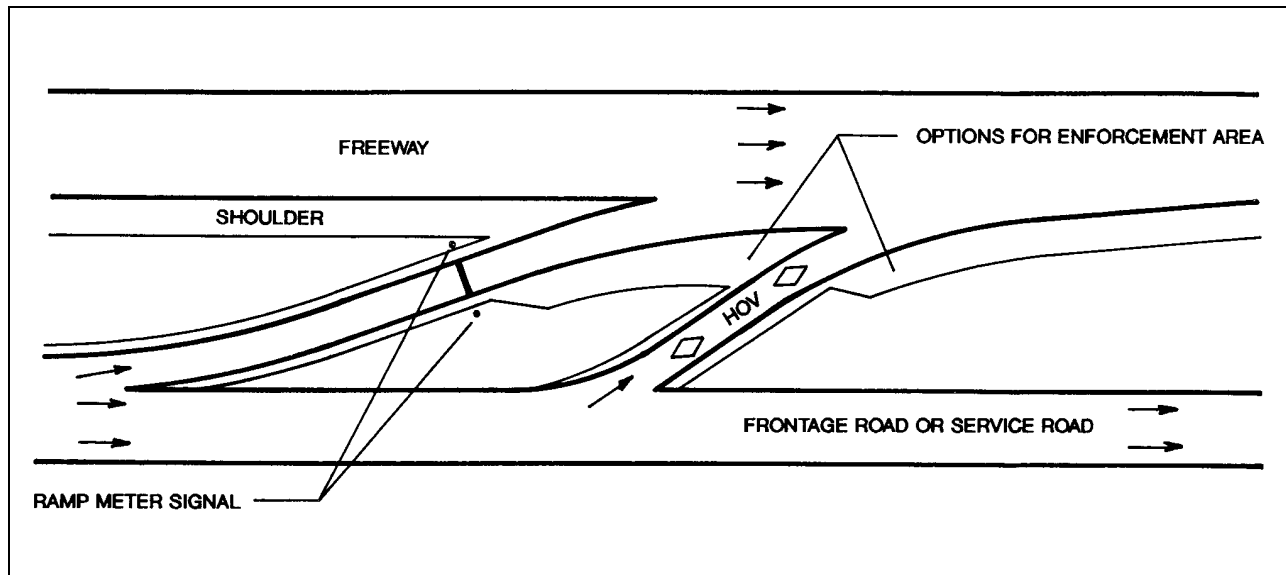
Separate HOV bypass lane at metered entrance ramp.
